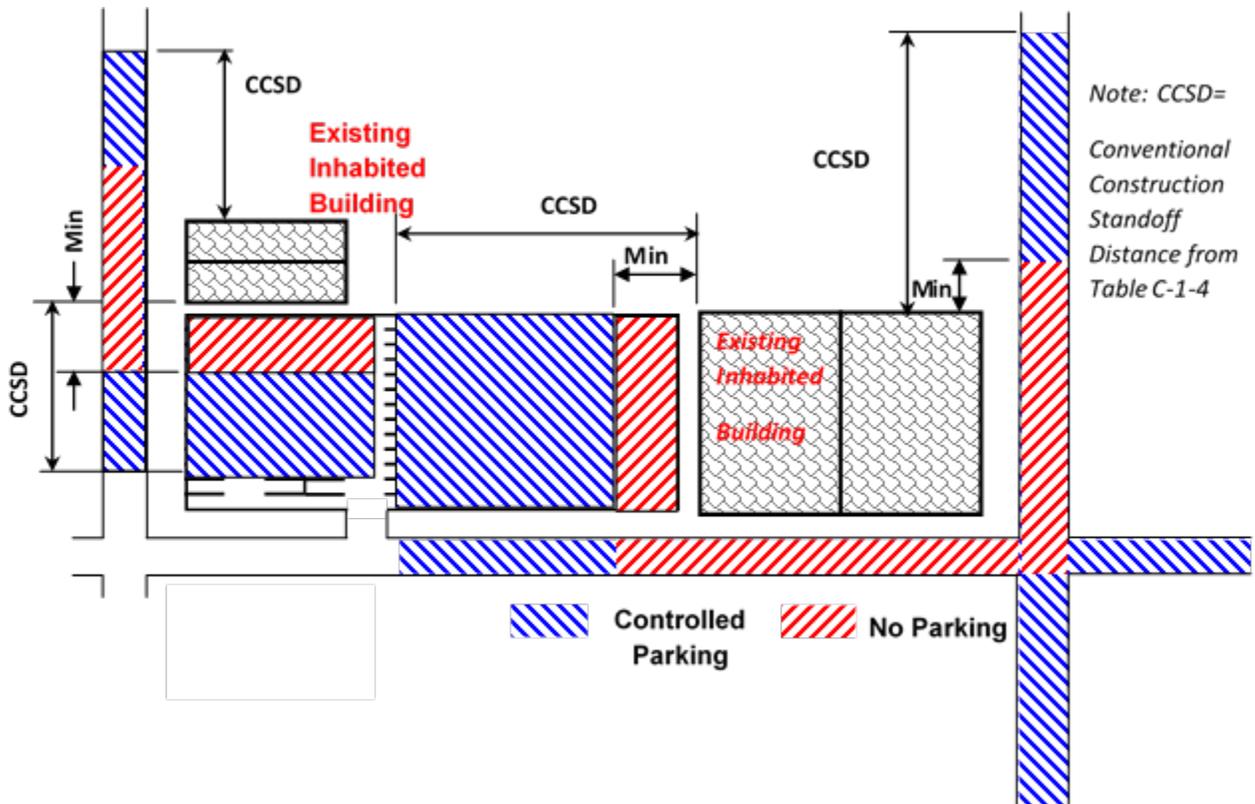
Parking and Roadway Control for Existing Buildings – No Controlled Perimeter
